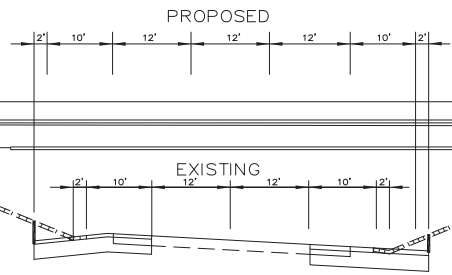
Potential Improvement Schematic Terry Hill Road/NYS Route 311
